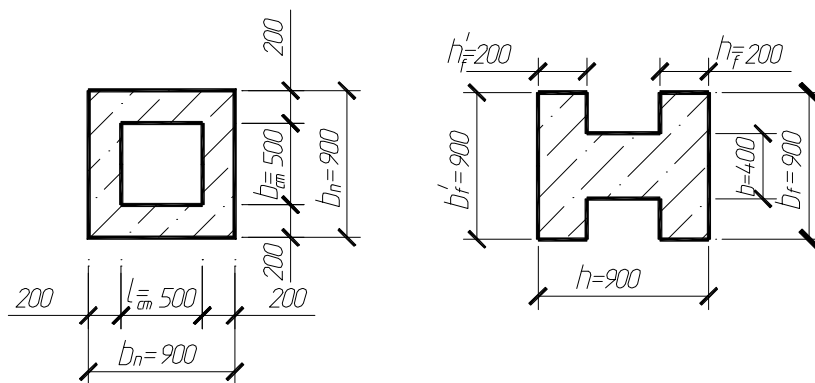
To calculations of a subcolumn on normal sections.
